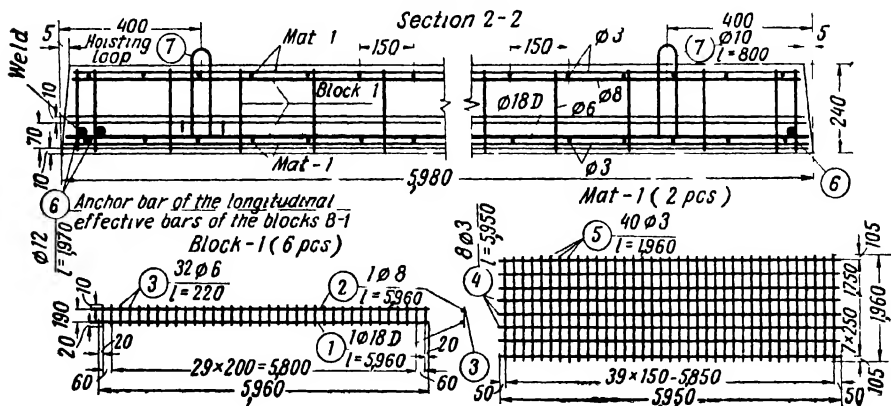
Illustrating problem 19 plan of a precast floor and details of the panel
